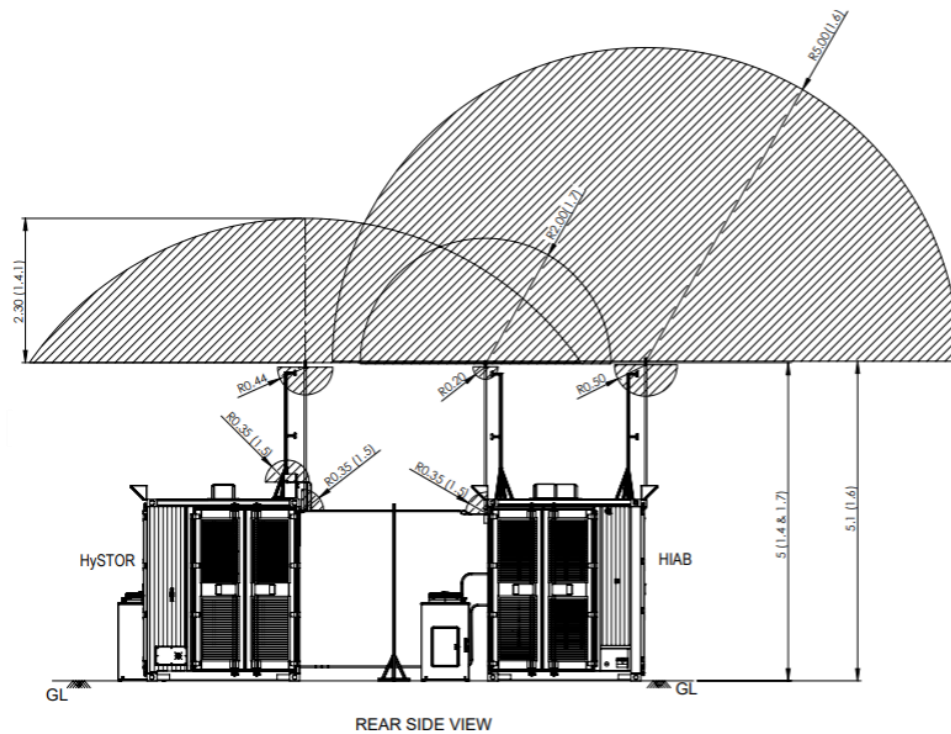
Hazardous area drawing extract for the SHyGaN system (rear side view)
